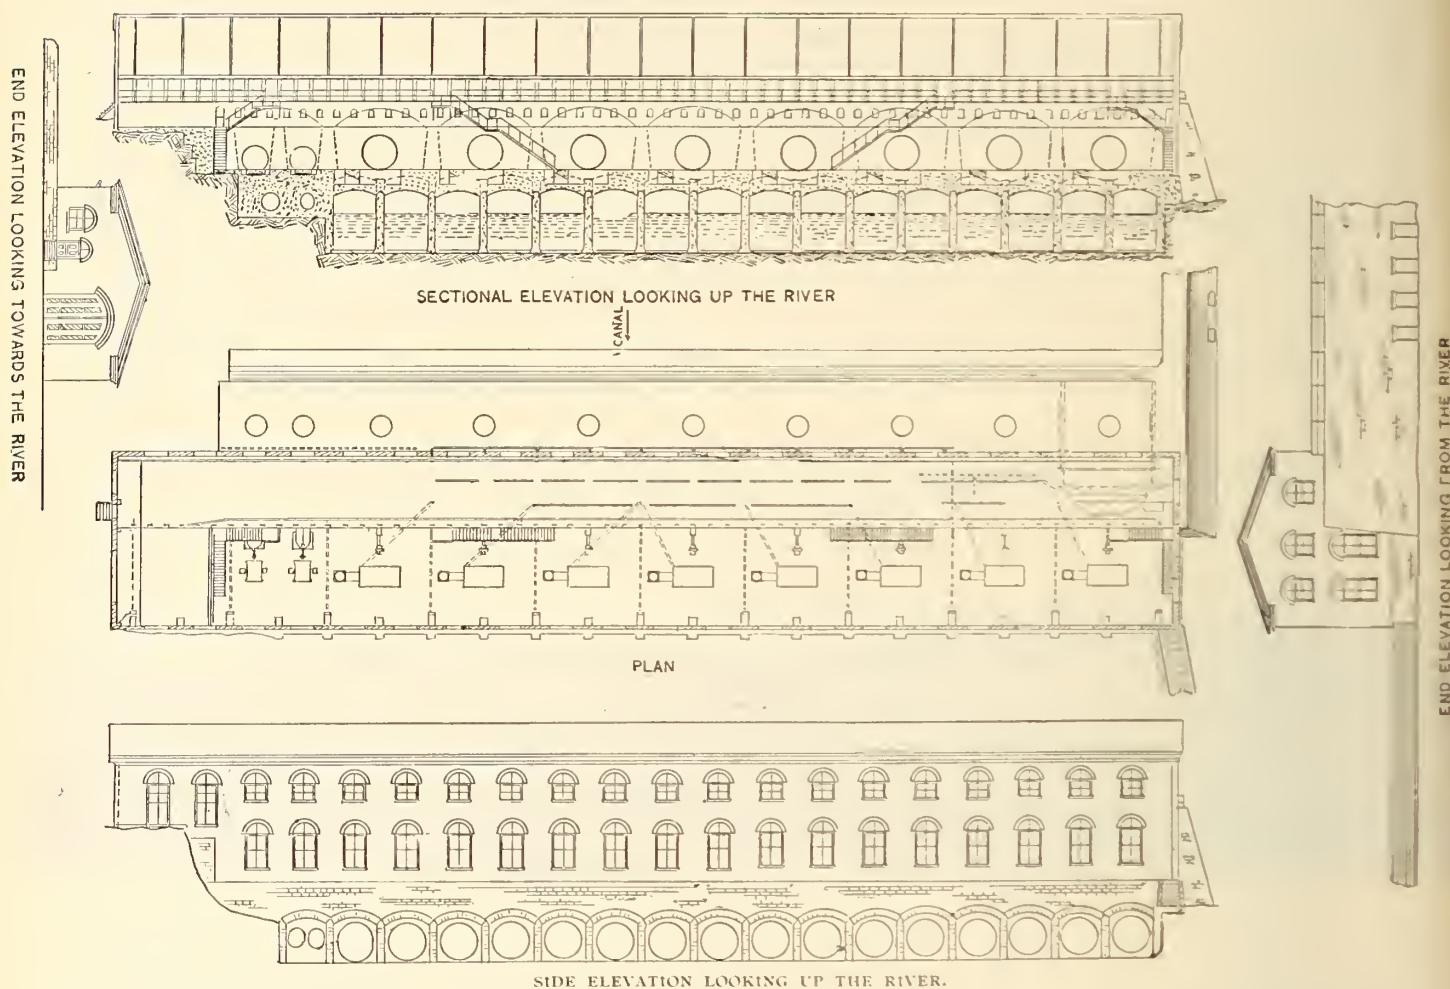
PLAN AND ELEVATION OF POWER HOUSE.
